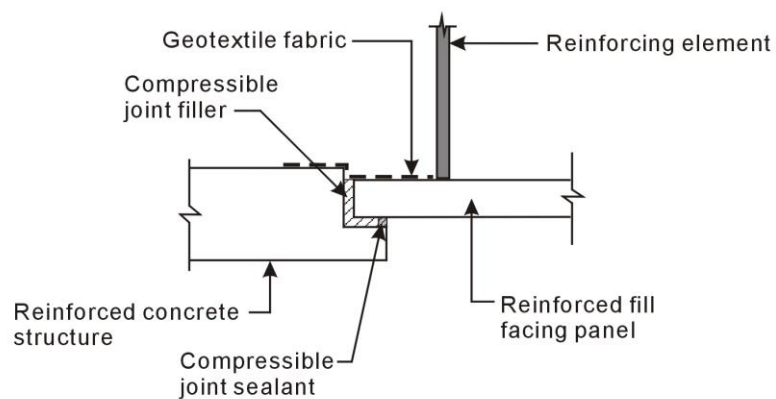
Typical Corner Details of Reinforced Fill Structures
